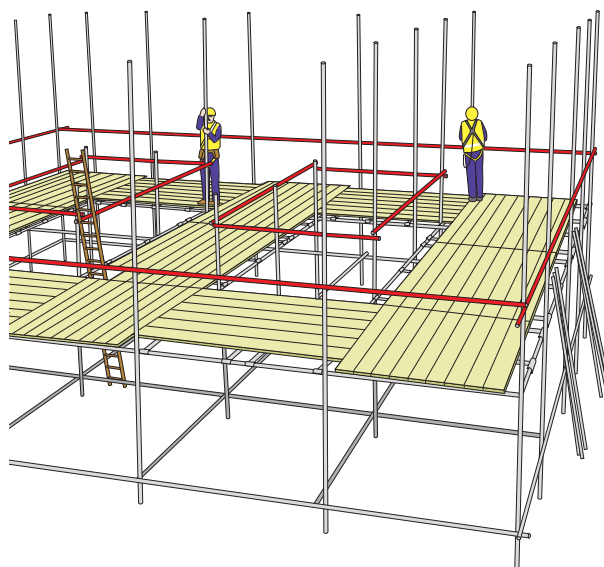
Example of a birdcage scaffolding system of work. Shows the scaffolders' safe zone used in runs for the erection of birdcage scaffolding. All bays can be reached to fix ledgers, transoms and braces without the requirement to fully board the entire structure.
